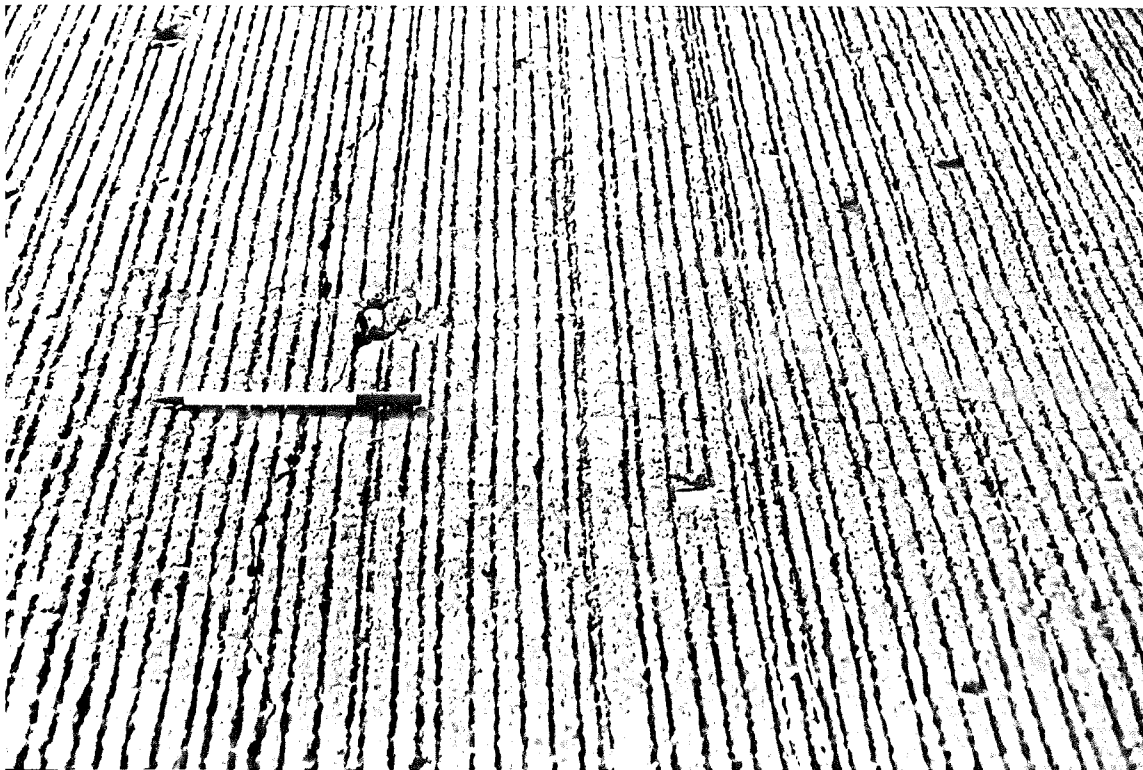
A closeup view of a tight crack on CSN# 19043-02234A, WB. The beginning of spalling can be seen in the center of the photo.
